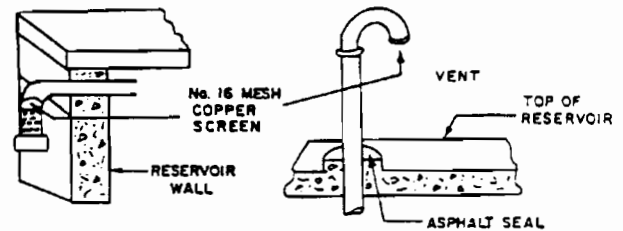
Vent and overflow configurations for underground storage tanks [1].
